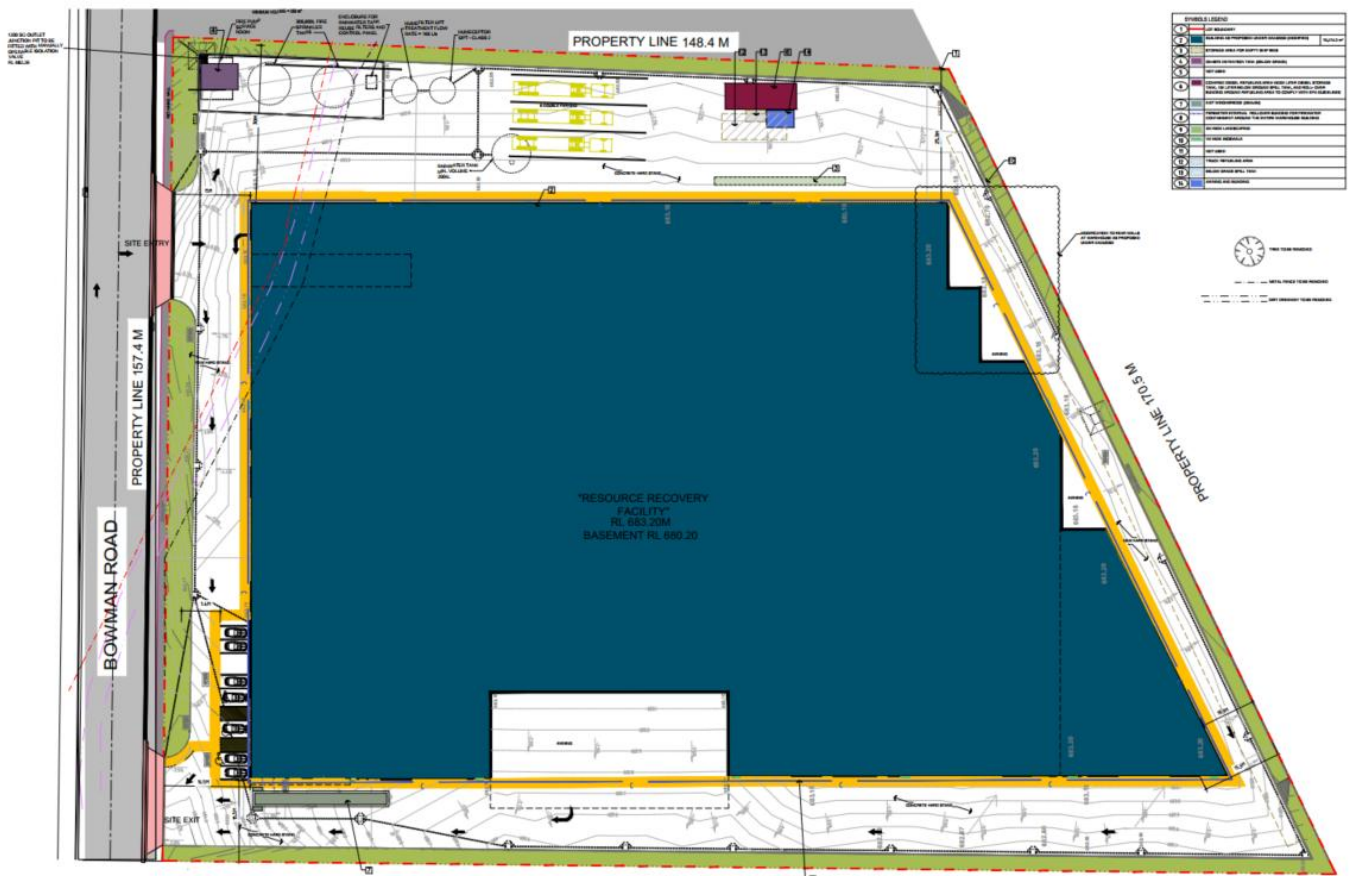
Proposed ground floor plan within Warehouse 1 on Created Lot 1.
